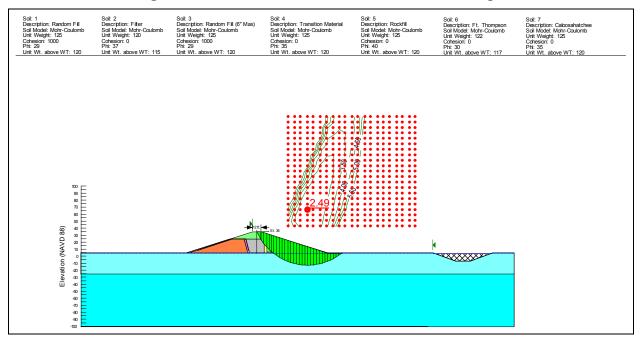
Steady Seepage with Normal Pool Downstream Slope
